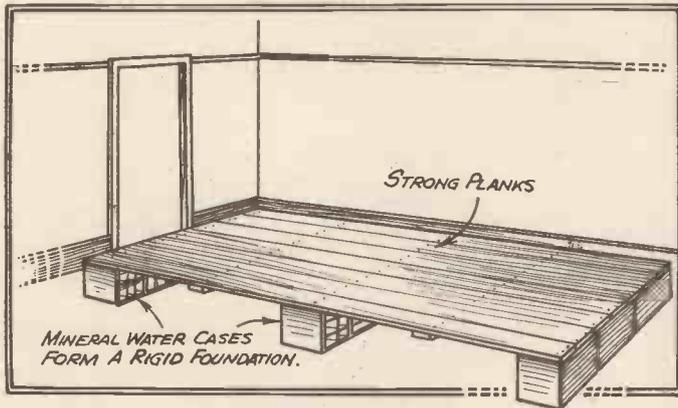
(left) A simply-constructed stage made from boxes and planks.
